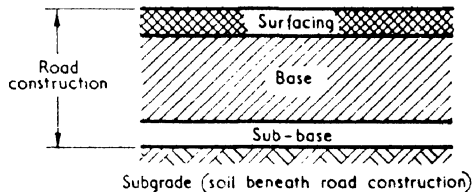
·1 BASIC STRUCTURAL ELEMENTS OF A PAVEMENT
